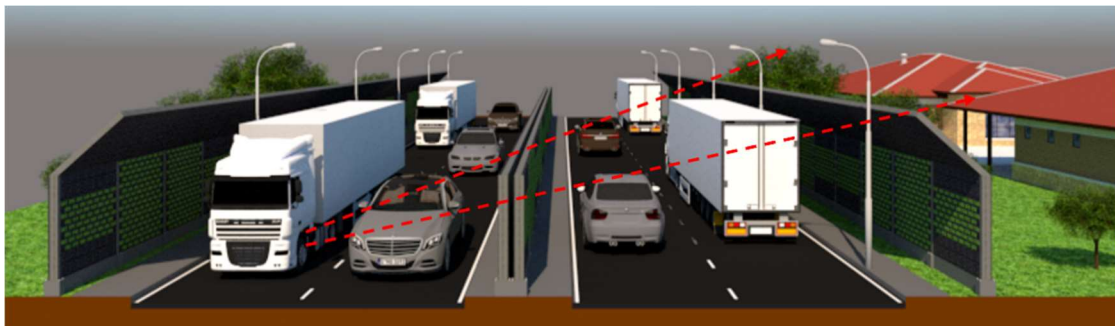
Applied noise reduction wall between two traffic lanes to improve protection
